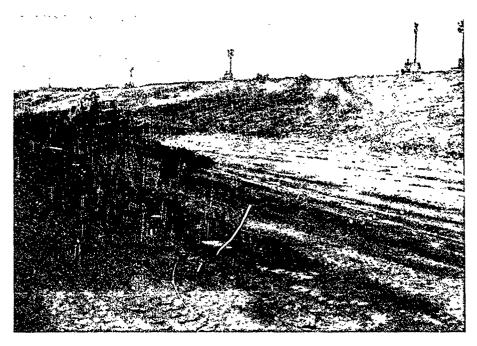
Outlet works excavation, right side looking downstream. Placing fill on fresh shale surface.
